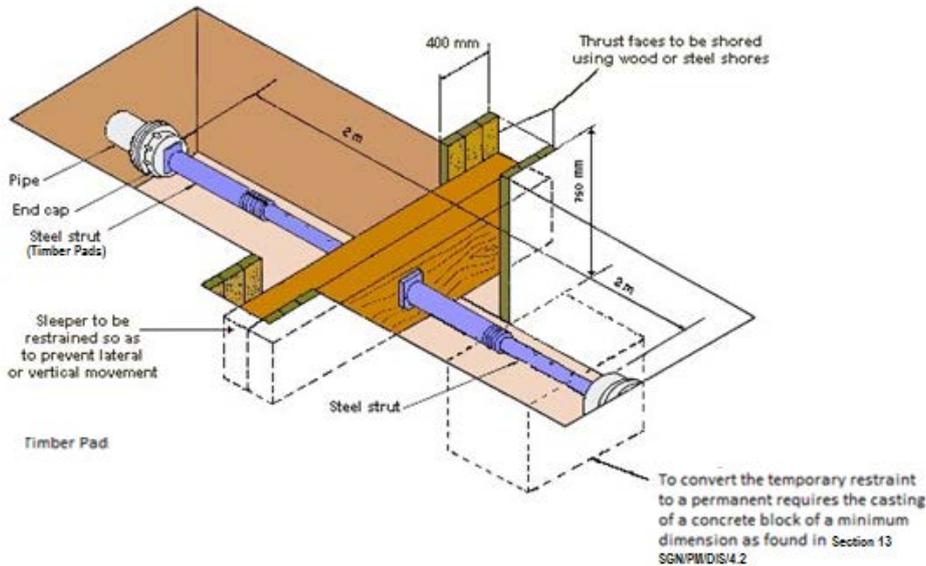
Double Strut Arrangement Where Distance Between Anchorage and Thrust Force Point is Greater than One Strut
